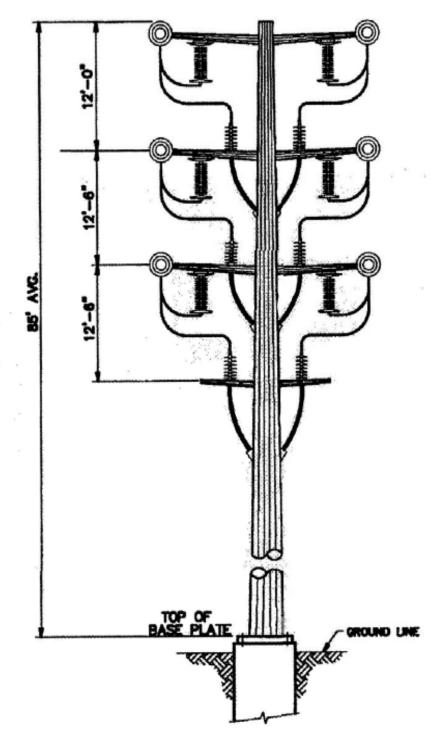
Proposed 69-kV Steel Riser Pole Source: SDG&E 2017
